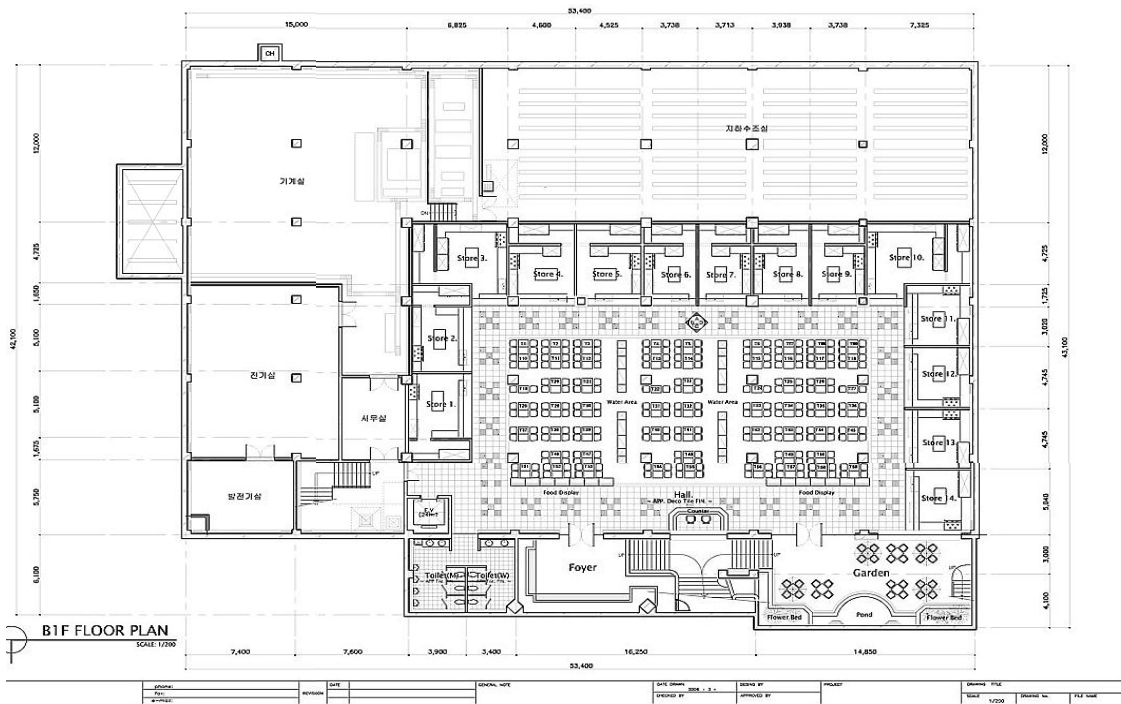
Jjimjilbang spaces. Basement floor plan.⁸⁷
